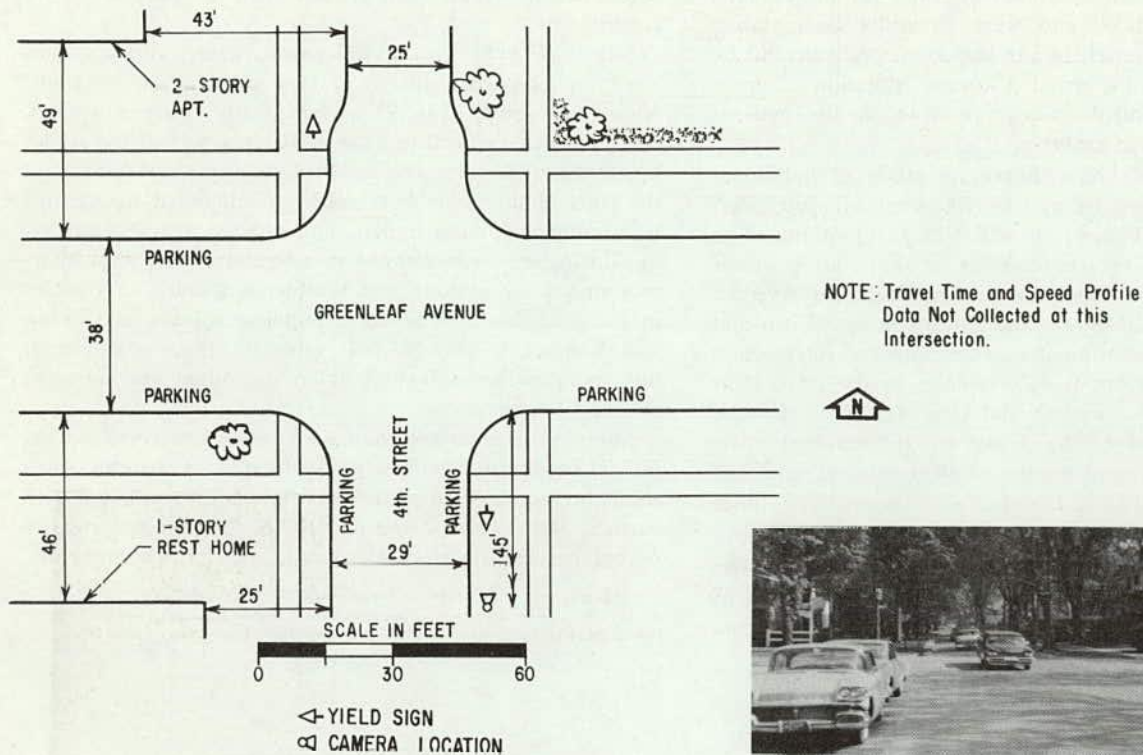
Intersection at 4th Street and Greenleaf Avenue (site A).
